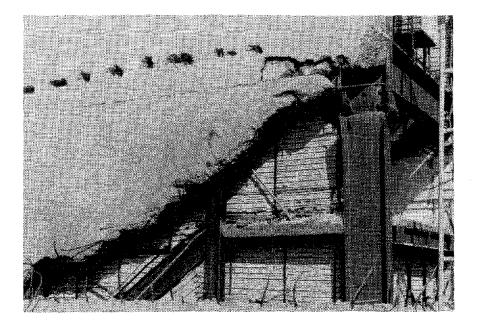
Steel column failure at stair landing, Cordova Building, 1964 Alaska Earthquake. (See also Fig. 2.9) (Photo courtesy of the American Iron and Steel Institute.)
